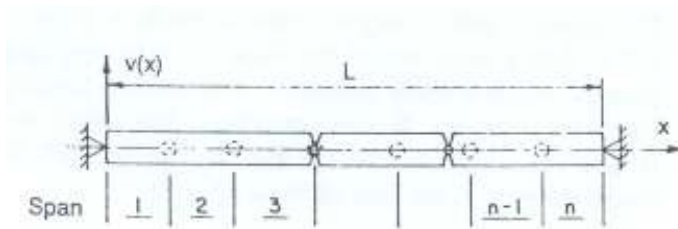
Plan View of a Bridge Subjected to a Transverse Earthquake Motion
